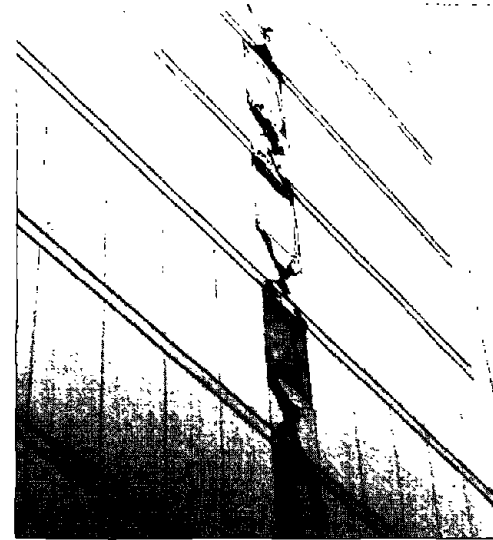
Shear Failure of Coupling Beams in 15-story Coupled Shear Wall
